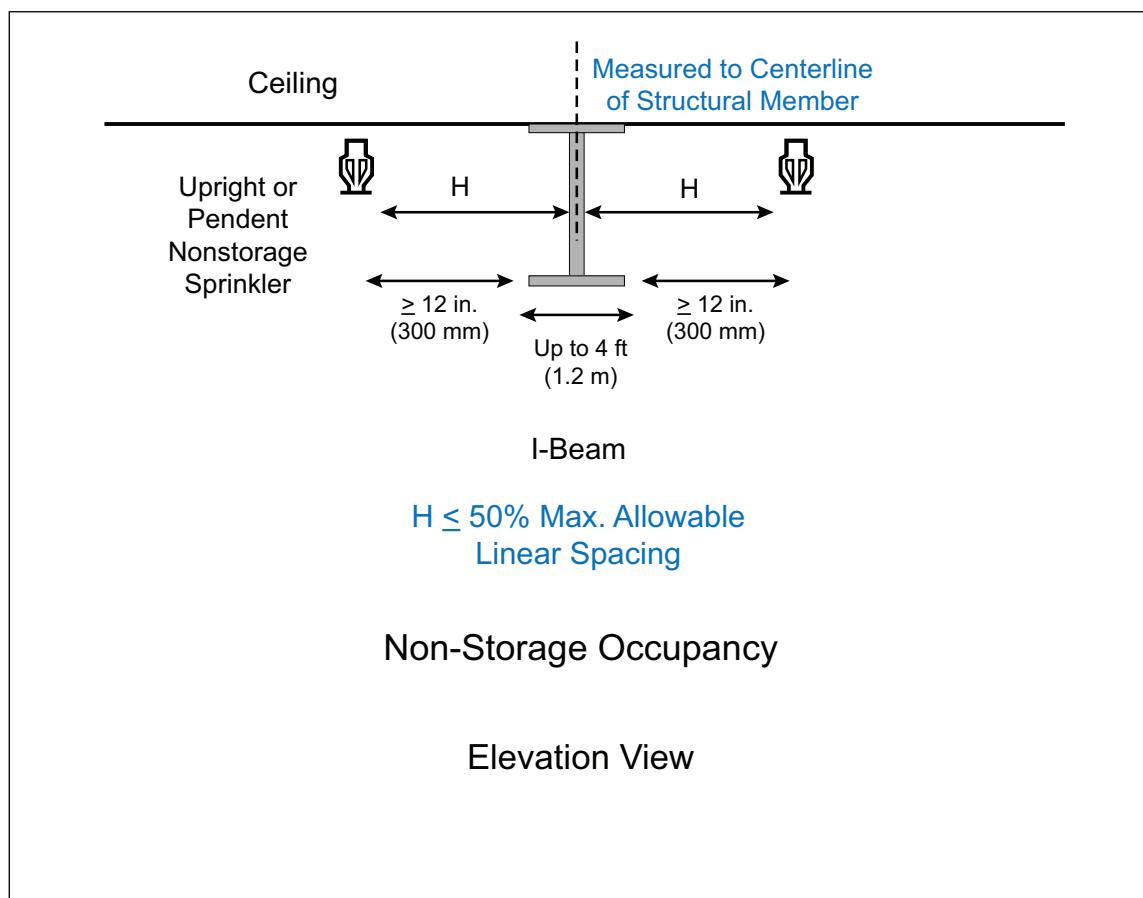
(b). Positioning ceiling-level sprinklers when ceiling structural members obstruct sprinkler discharge
